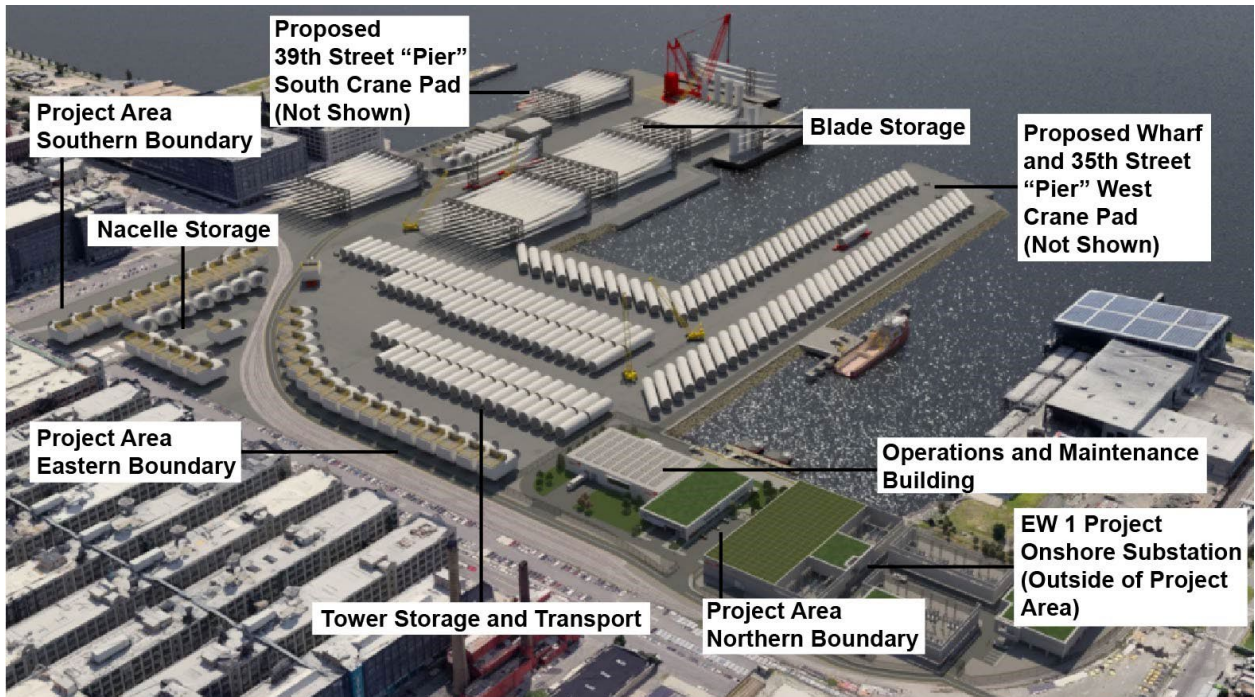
Proposed Project Site Plan - Conceptual
